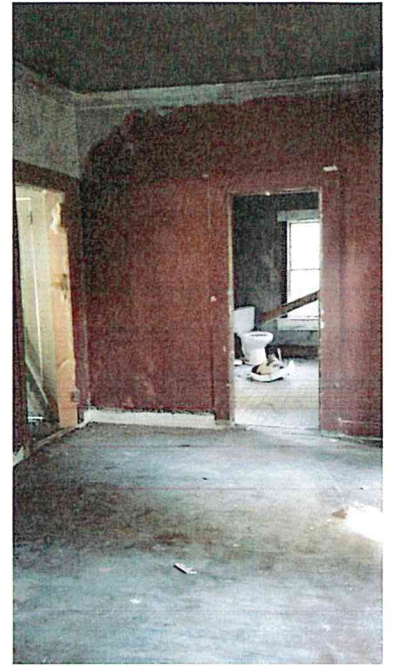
EXHIBIT C: PHOTOS OF SUBJECT SITE INTERIOR
